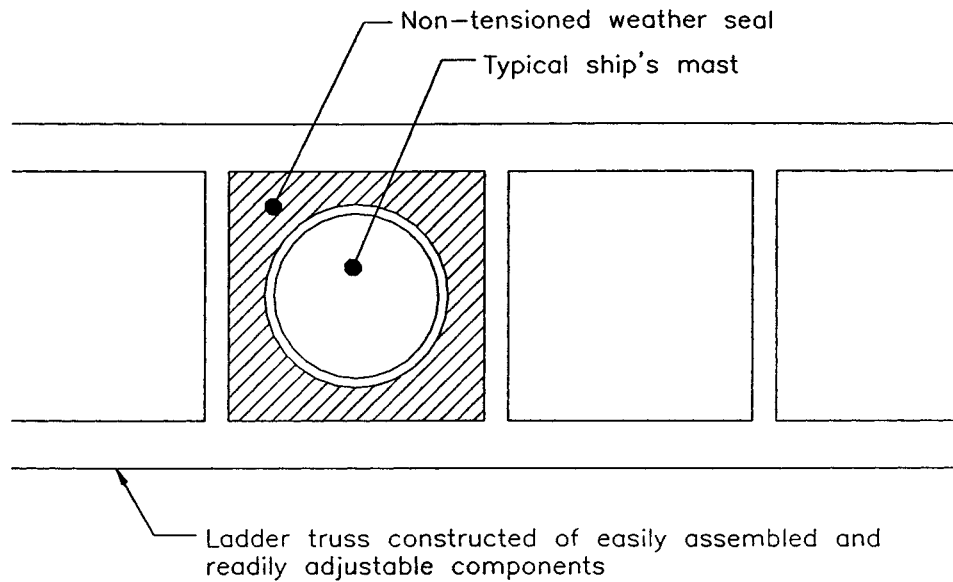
A ladder truss supporting a non-tensioned weather seal.
